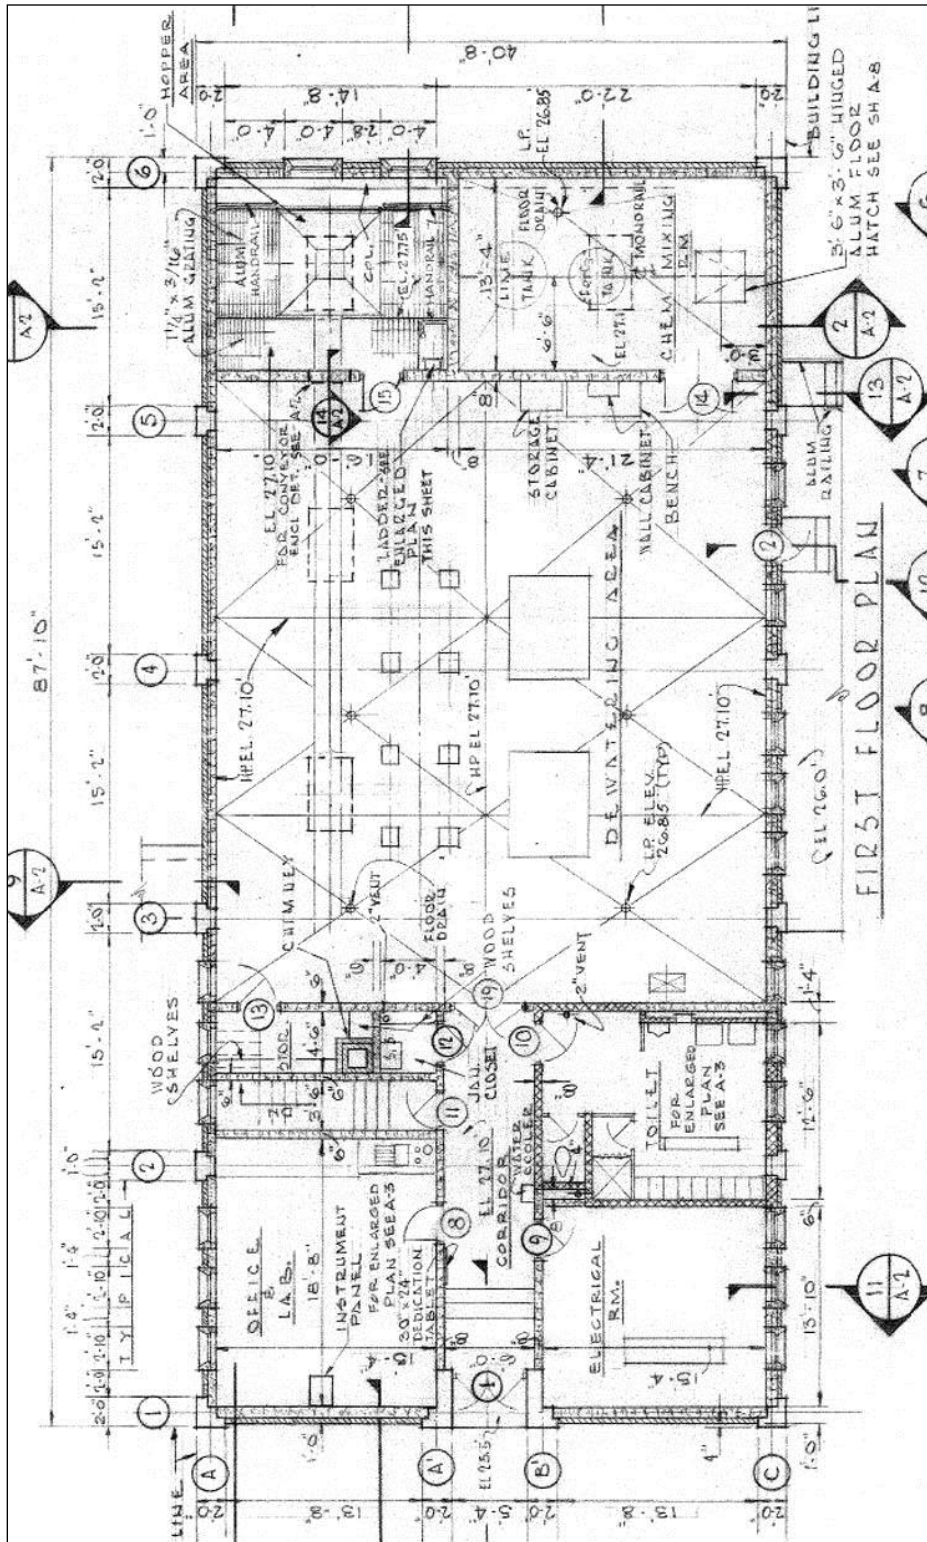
Record drawing of First Floor Plan of Operations Building built 1965, converted to present Sludge Processing Building in 1993. Clip from sheet A-2, Operations Building, Plans and Elevations (Metcalf & Eddy, 1963).
